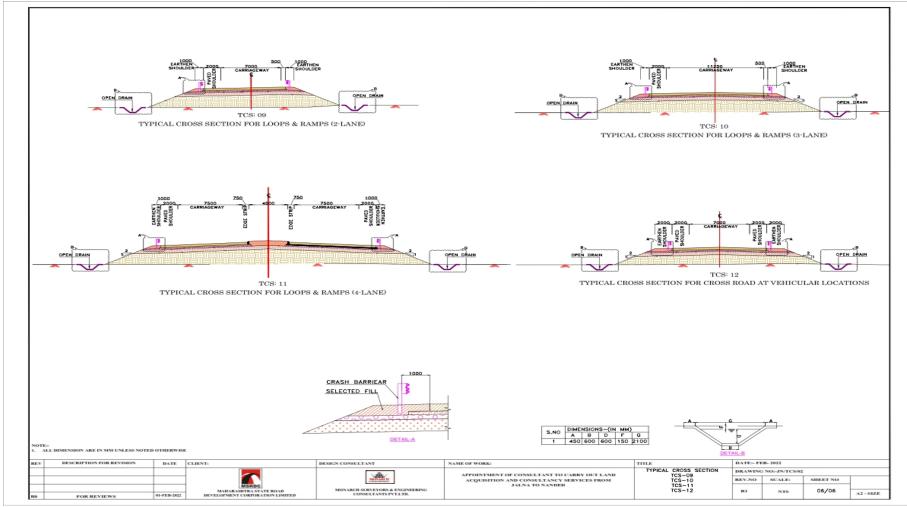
F: (Typ.) Cross Section of Proposed Alignment
